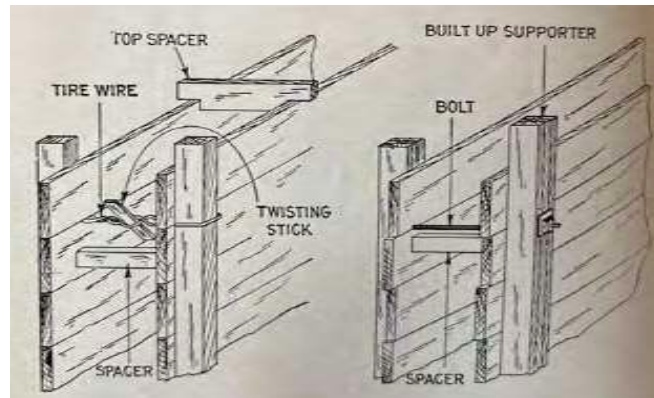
Twisted wire and bolt braces as used on concrete forms to insure maintaining the proper distance between the retaining boards. The tie wire braces are tightened by twisting. (Source: Concrete Construction, International Textbook Company Ics)
